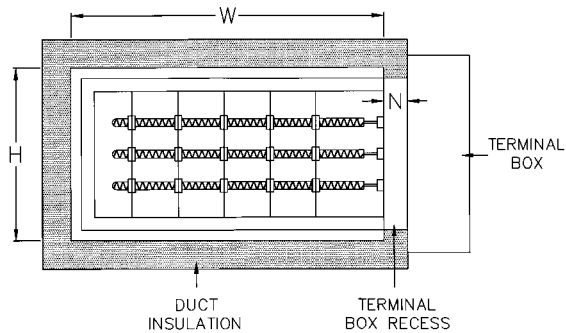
Installation of slip-in heater where insulation is more than 1" (25.4 mm) thick
